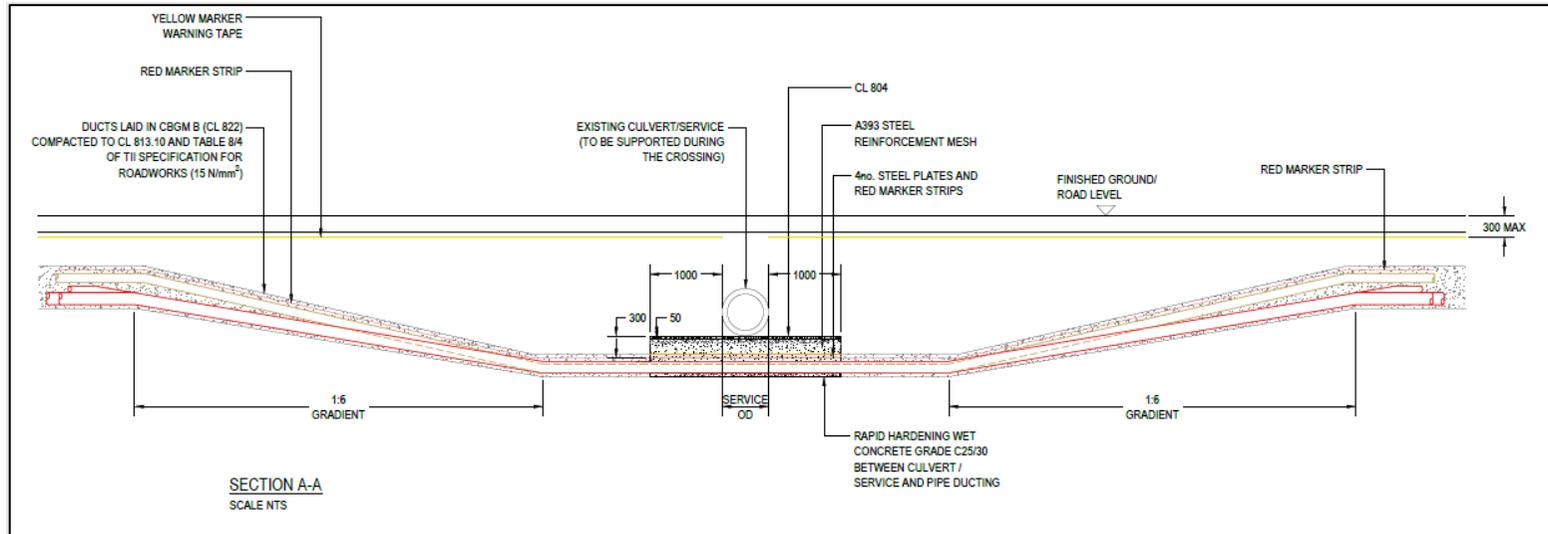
Typical Cable Service Pipe Undercrossing Detail
